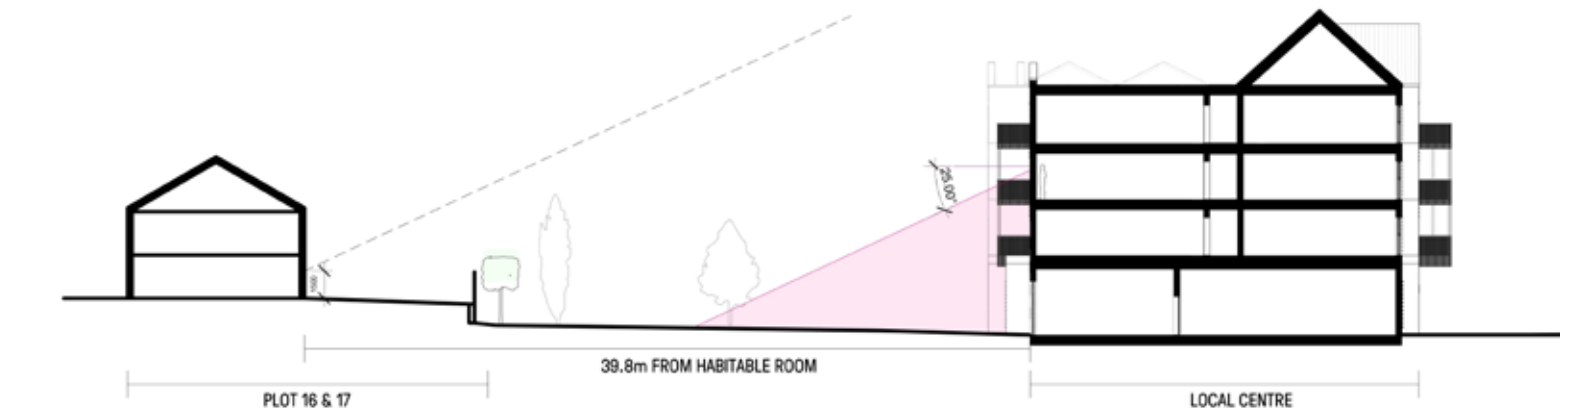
Local Centre & Plot 16 & 17 Second Floor Privacy Section post Design Workshop/Update
